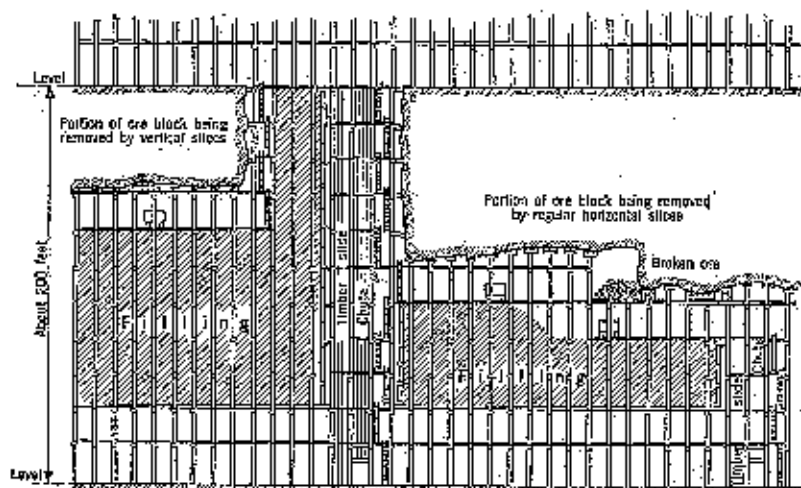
Generalized section, showing method of stoping and timbering, Hecla mine, Idaho.
